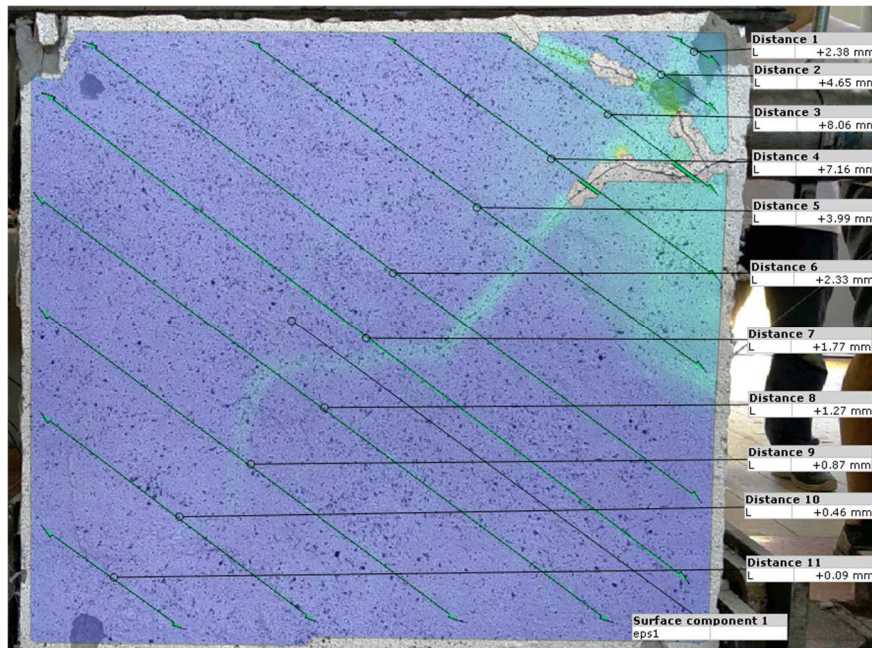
DIC analysis of the retrofitted masonry wall HBW3, when maximum crack or opening observed.
